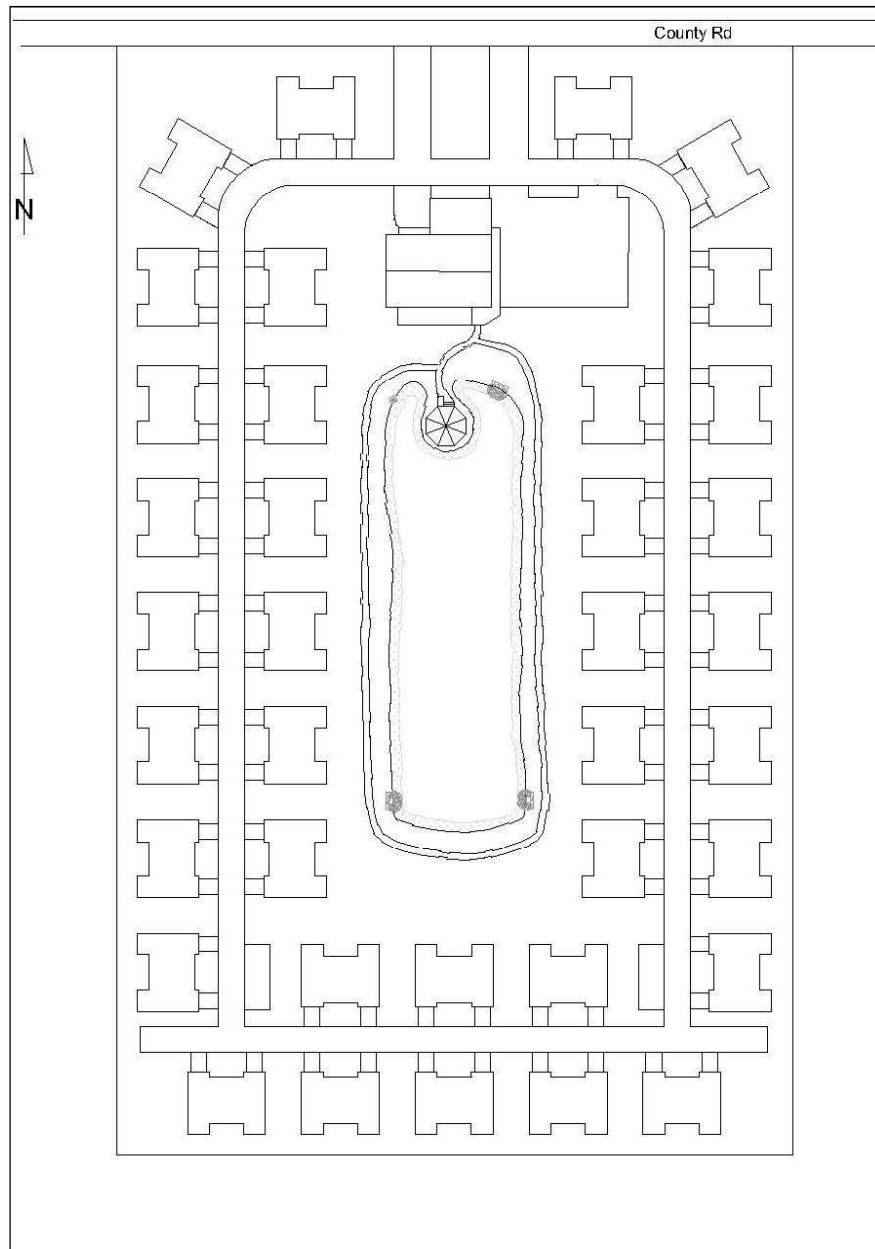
B.1. Autumn Knoll Subdivision Site Plan.
